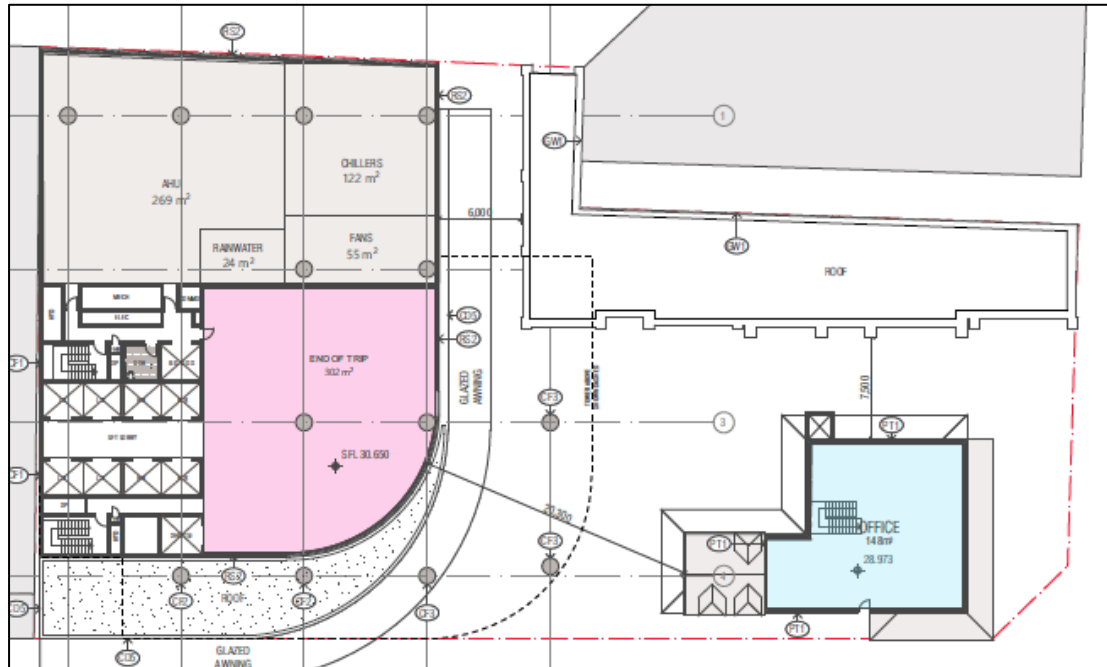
Proposed Level Two (Plant) Plan (FK Architects, 2018)
